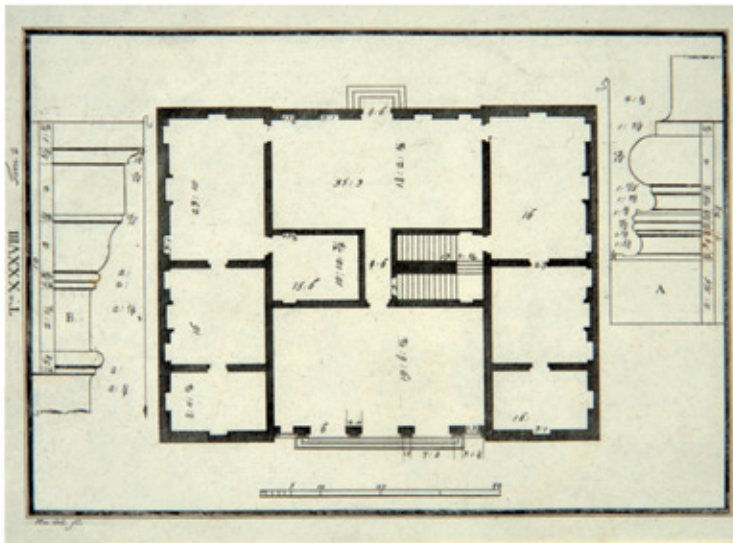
Plan of Villa Trissino at Cricoli, main floor
